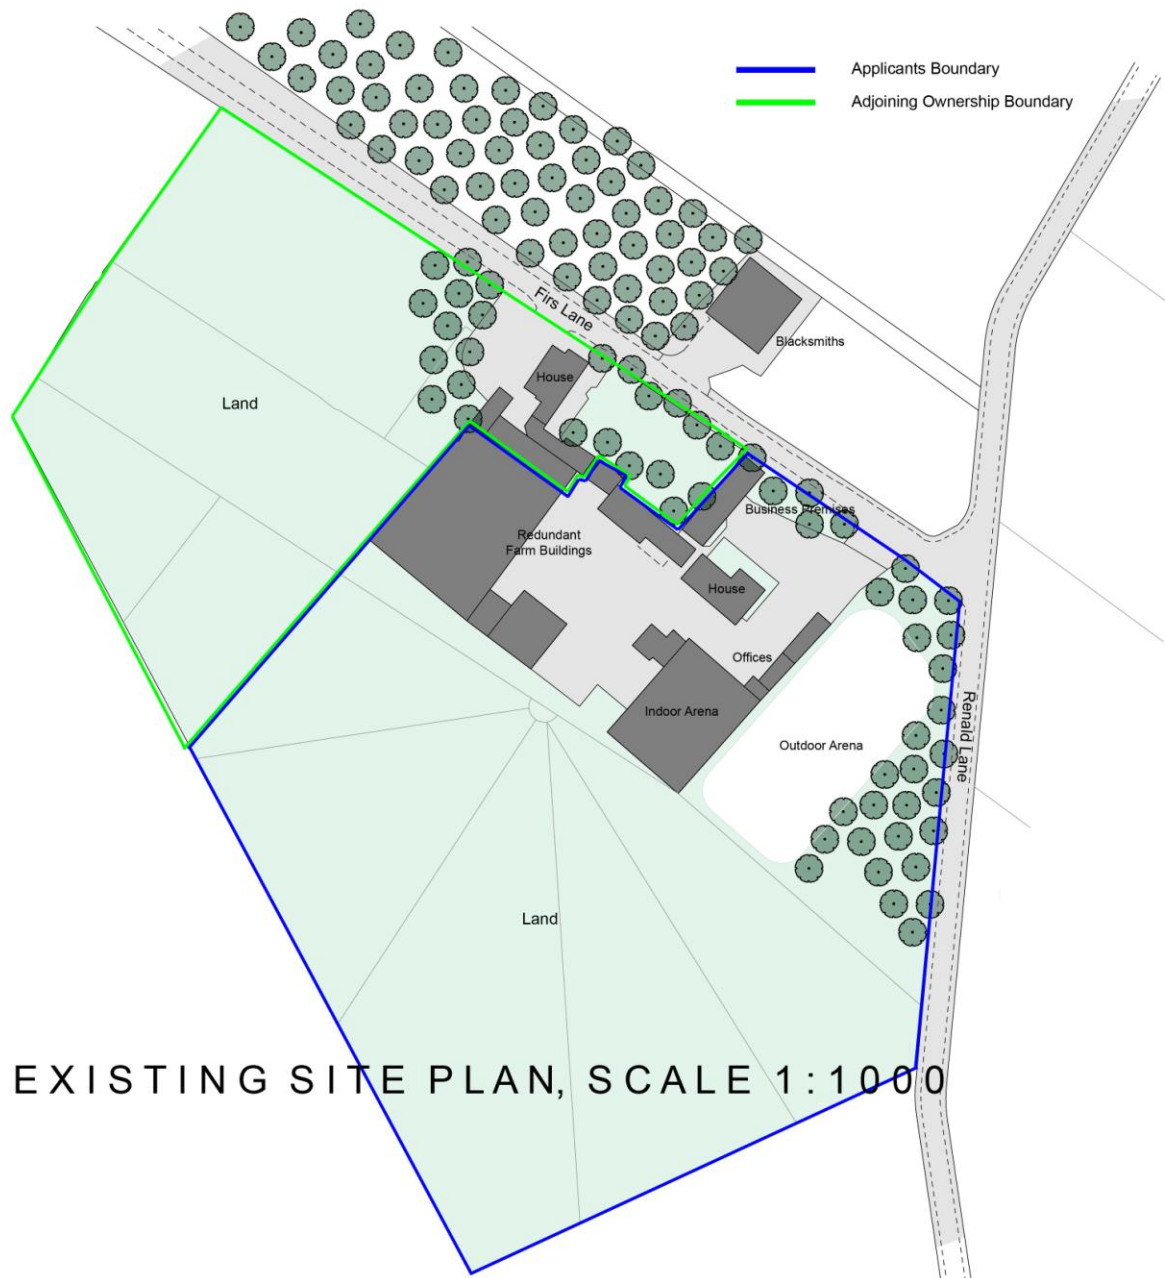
Existing Site Plan of Crabtree Arena showing site boundaries.
